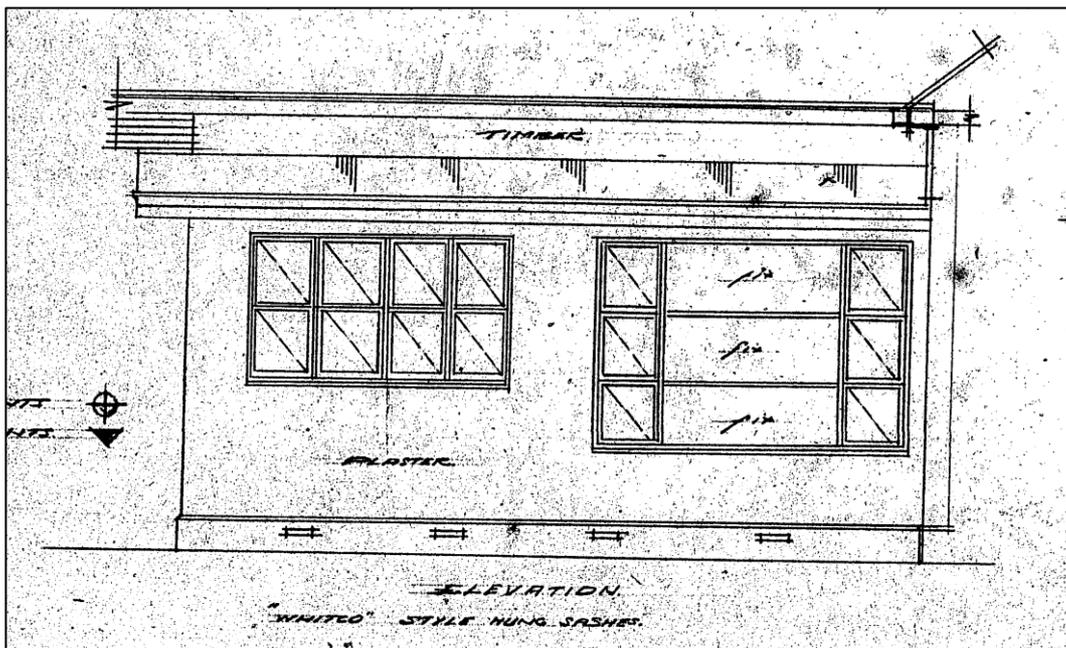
Detail from the 1956 alterations showing the proposed west elevation (Building Plans, DCC Archives).
